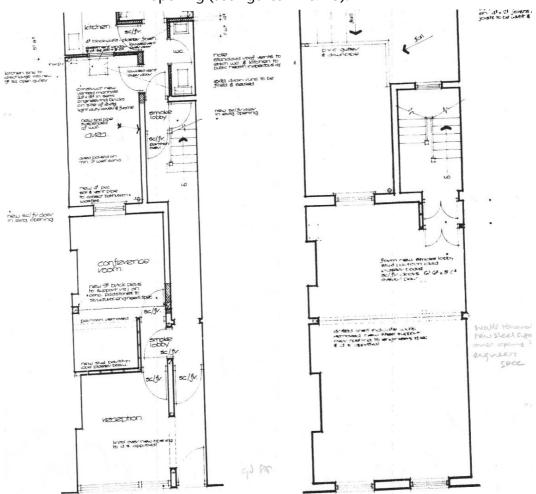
The premises in 1940 [© Camden Local Studies, Drainage Plans for 18 Tower St (1940)]
